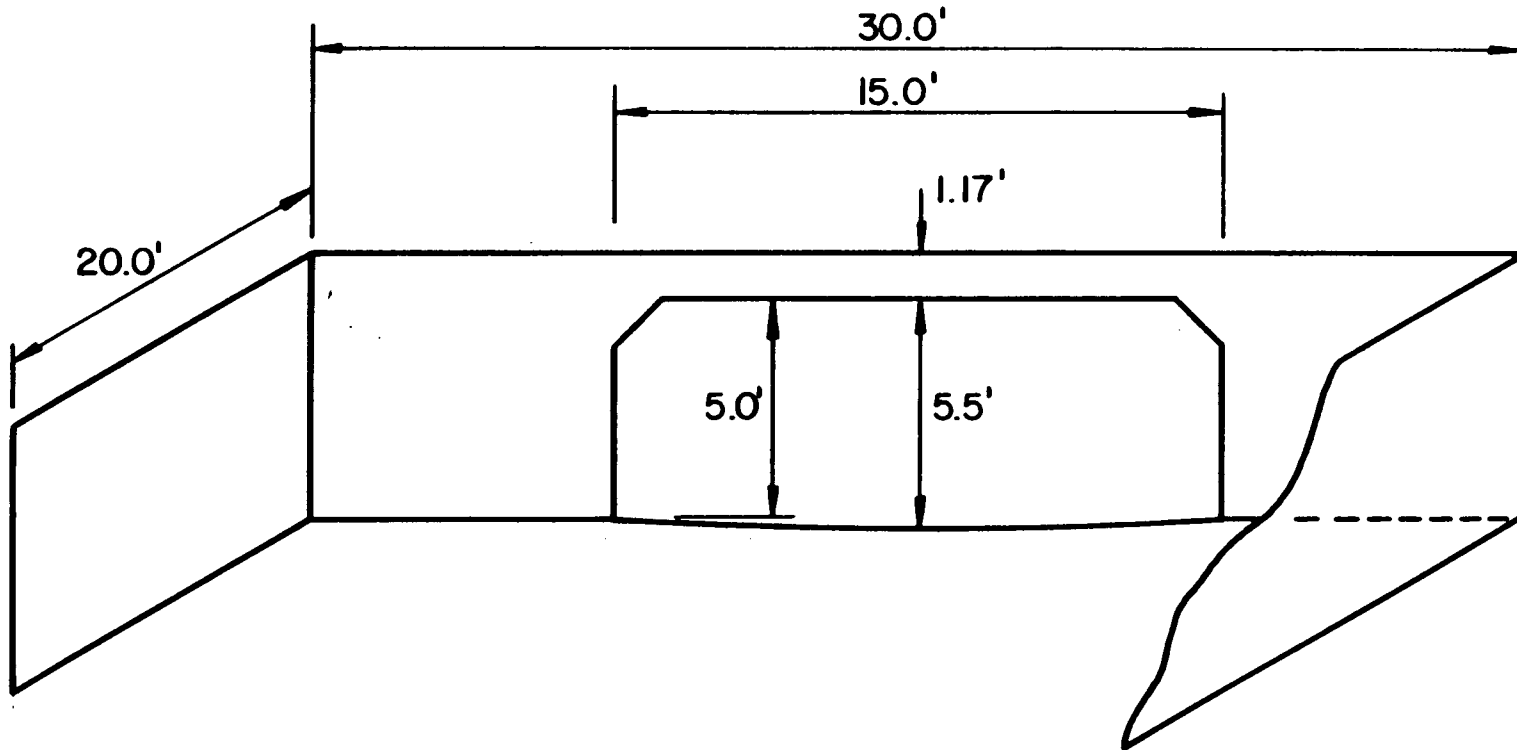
The proposed culvert inlet showing dimensions of the head wall and wing wall. The ledge and grating are not shown.
